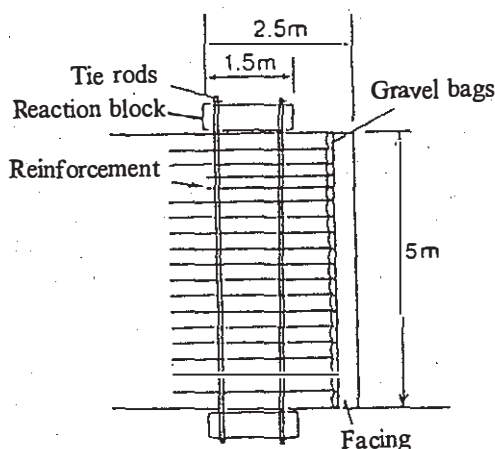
Typical PL/PS GRS retaining wall (Tatsuoka, et al., 1996b.)
